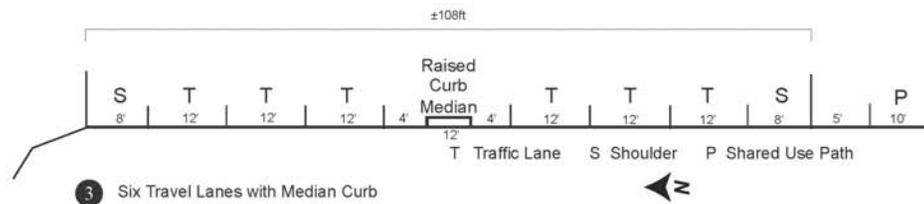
PREFERRED ALTERNATIVE BETWEEN DOWELL ROAD AND FAIRGROUNDS ROAD
